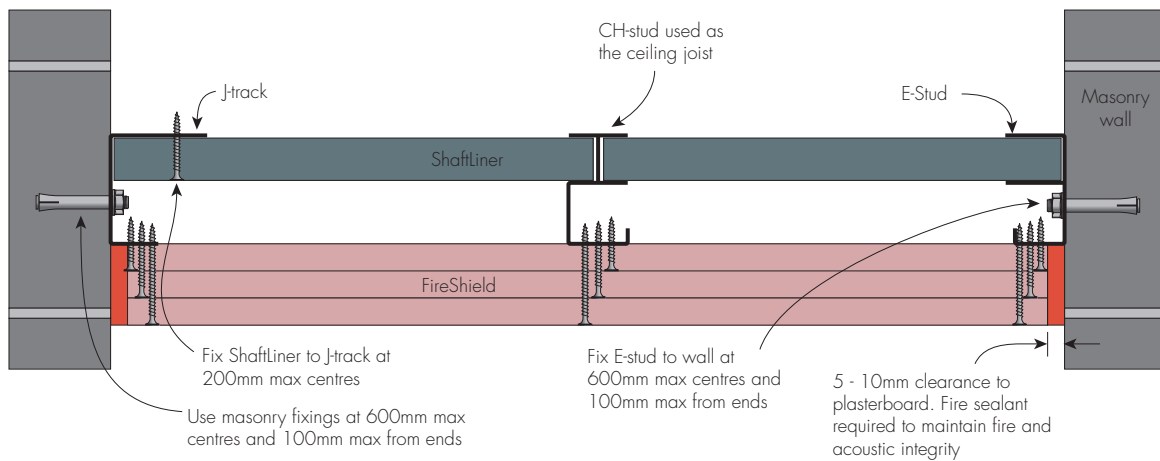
Horizontal Shaft Wall Non-Trafficable Ceiling to Masonry Wall
